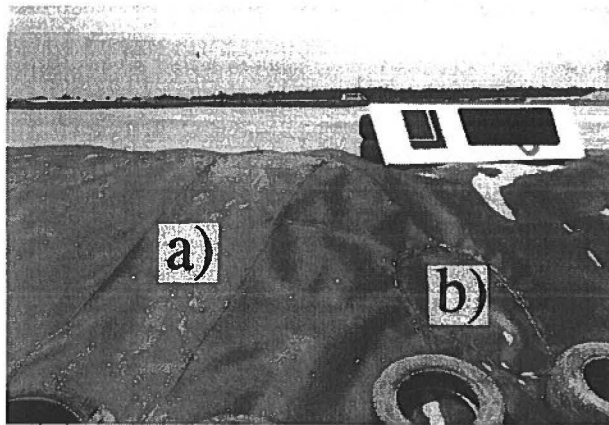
Geomembrane welding system: a) double hot wedge; b) extrusion
